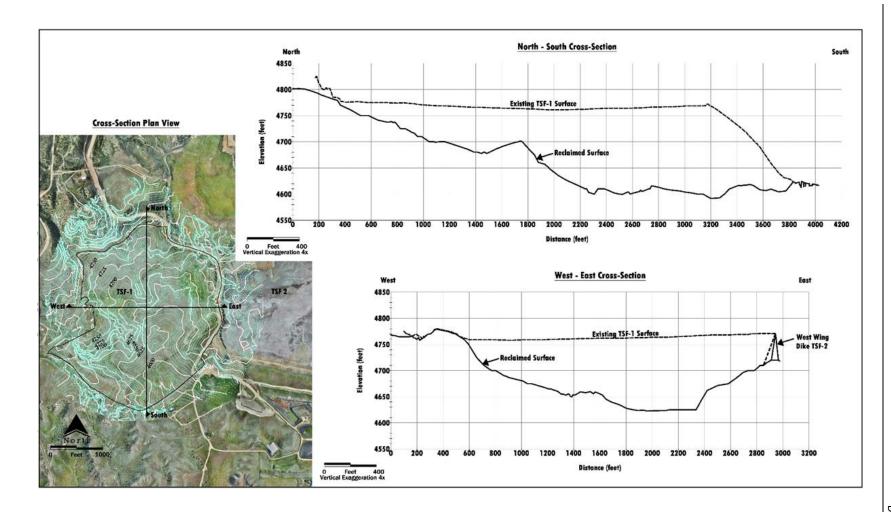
Final Grading Plan for Tailings Storage Facility 1 (GSM 2021)
